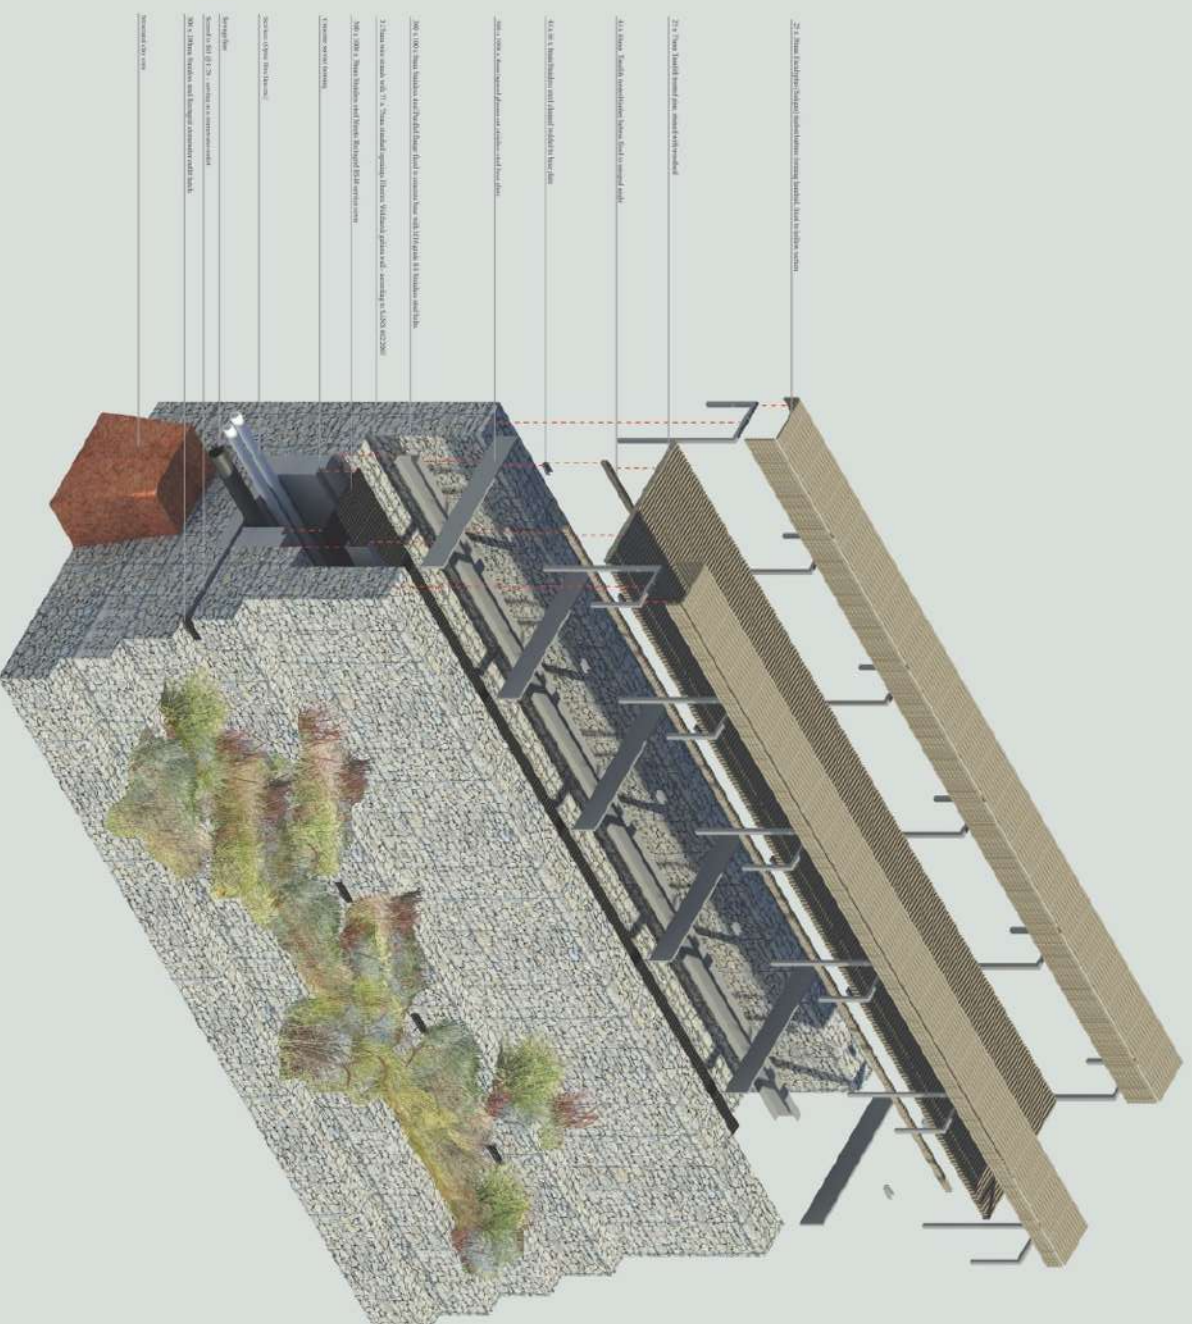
Living wall exploded axonometric (Author: 2019)
